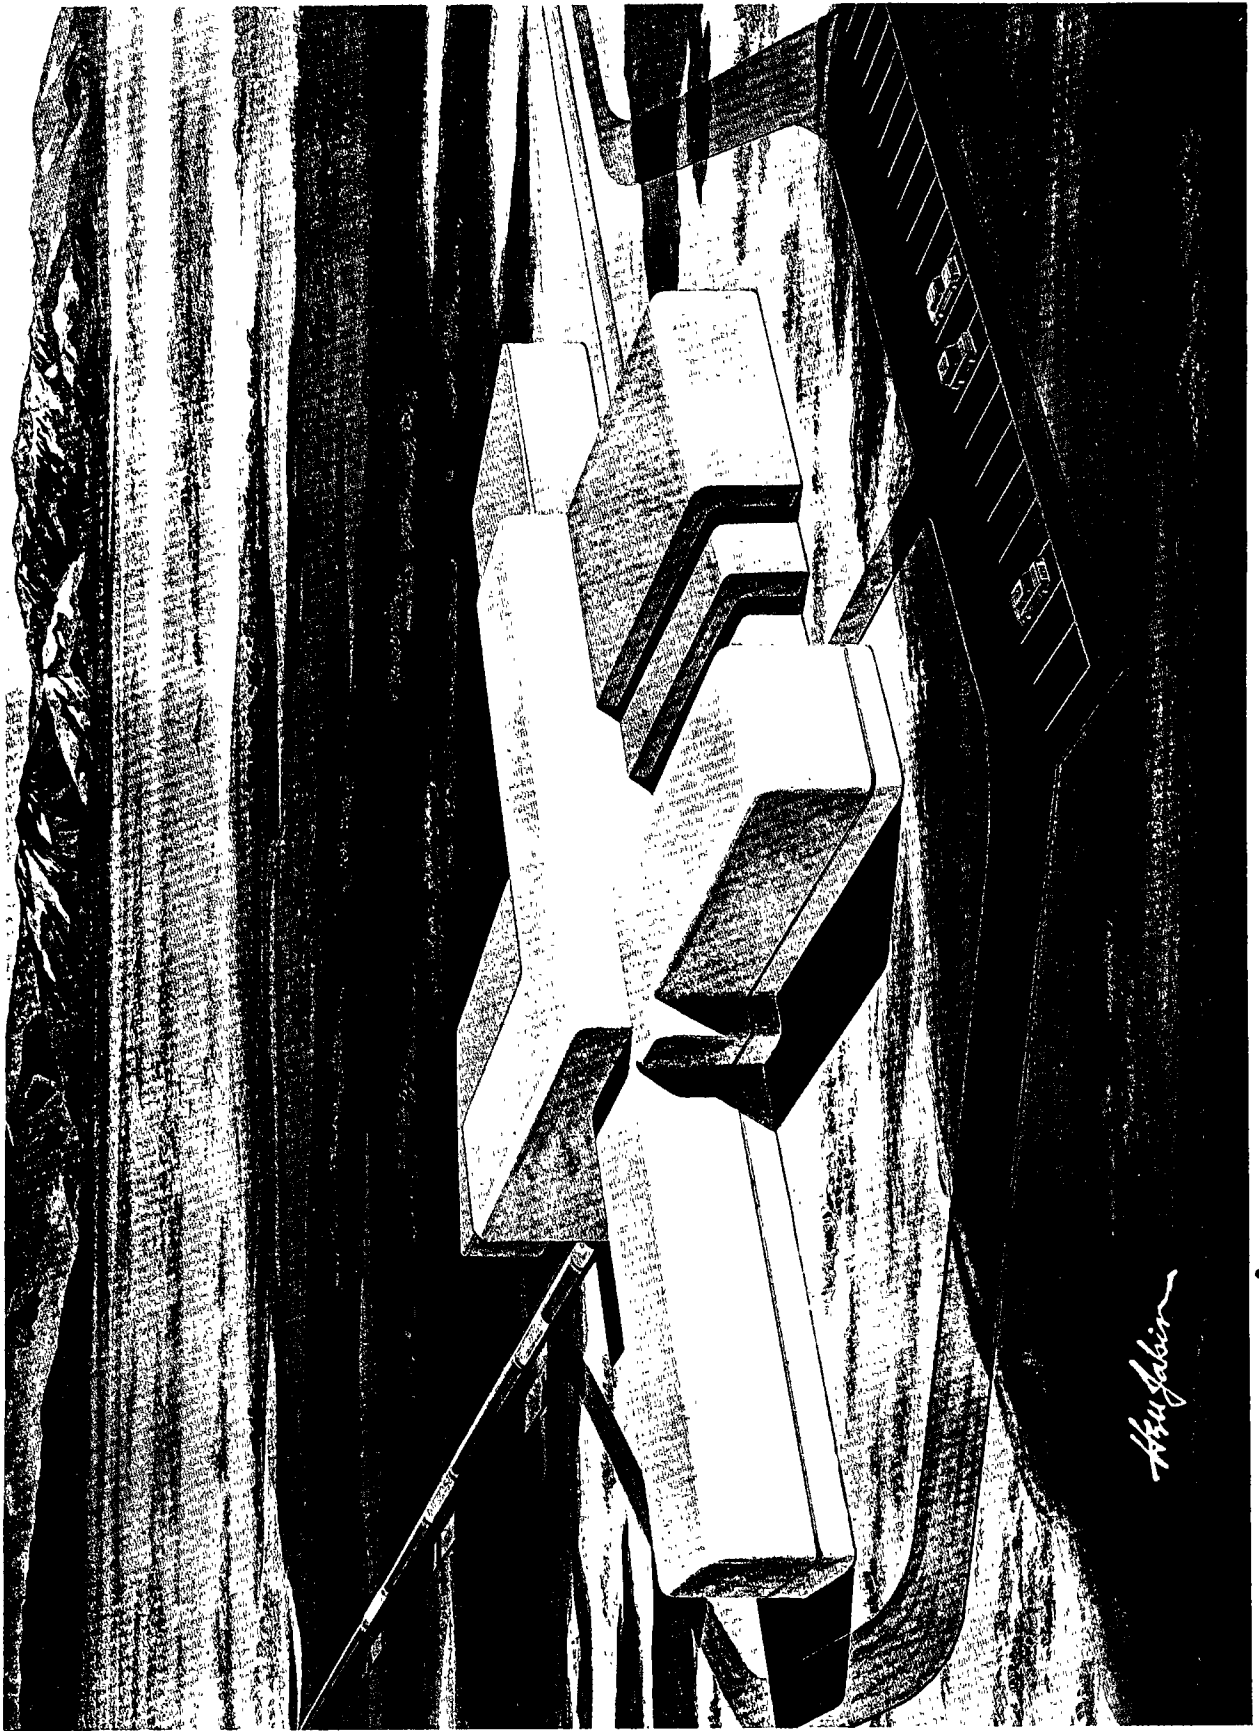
Schematic layout of LIGO Site at Hanford, WA
